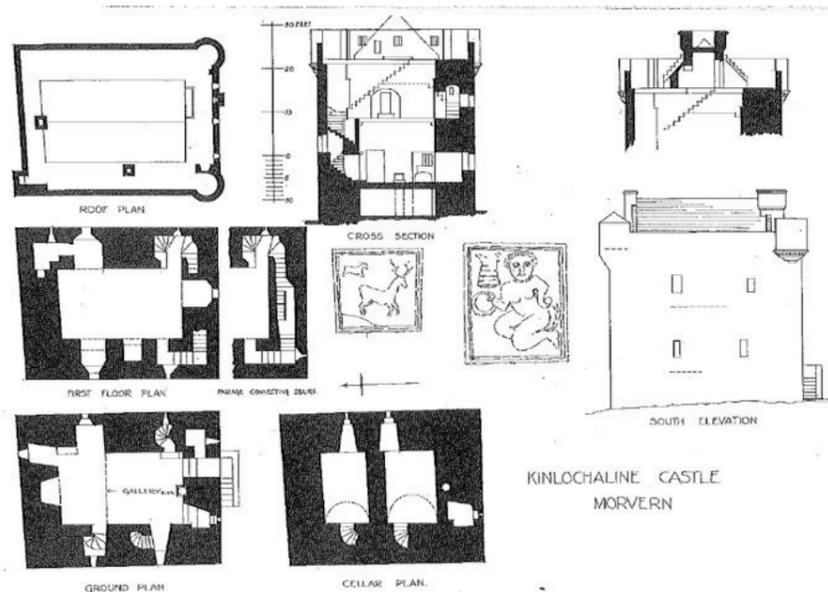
Plans, sections and details (Ardtornish Estate Archive)
